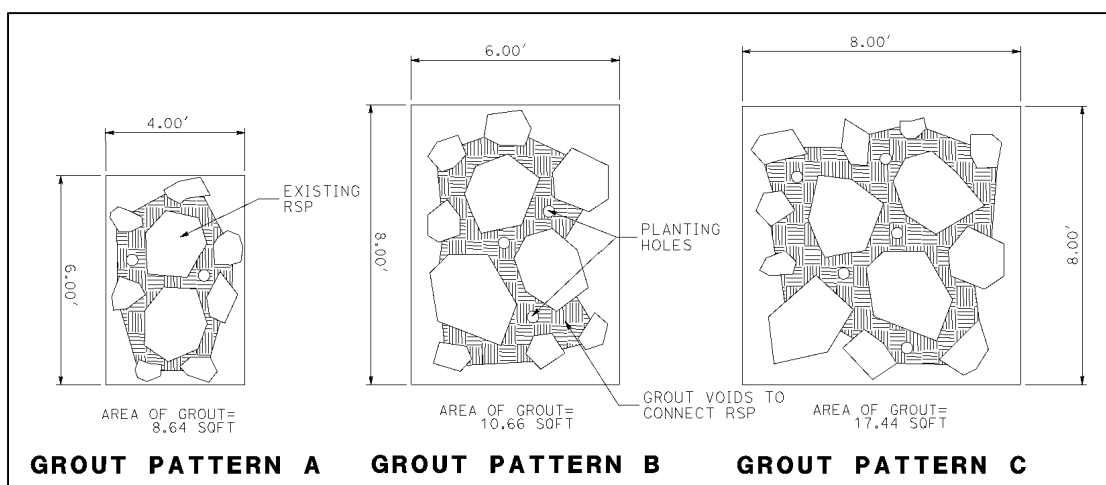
Plant tubes within Grouted Rock Slope Protection Voids
